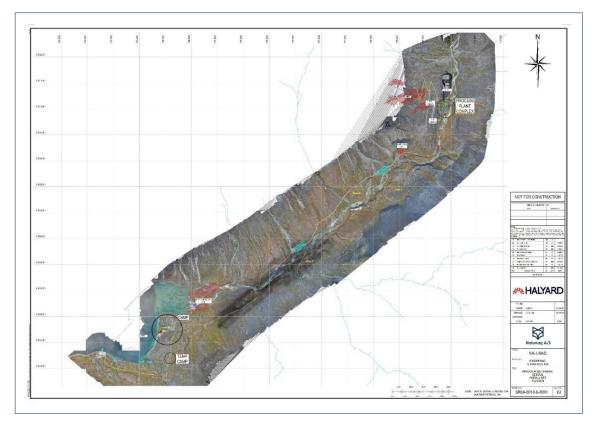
Nalunaq - Planned Site Layout (Source: Halyard, 2021)
